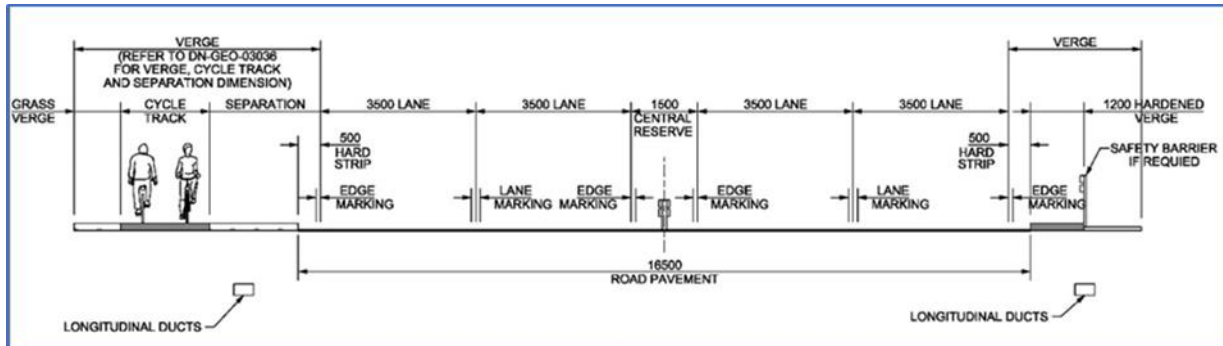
Typical Cross Section – Type 2 Carriageway
